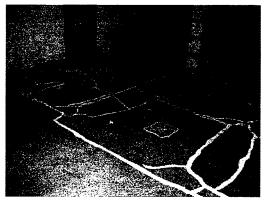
is a typical view of interior installed suction piping for suction point 3B-B in Building #3.
